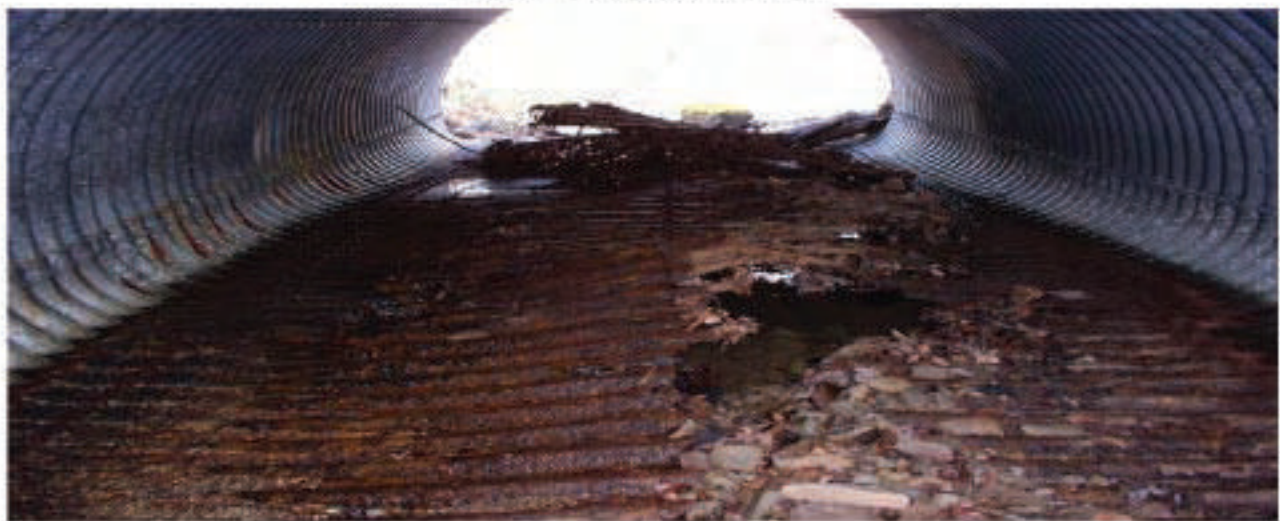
Corrosion Failure of Culvert Invert
